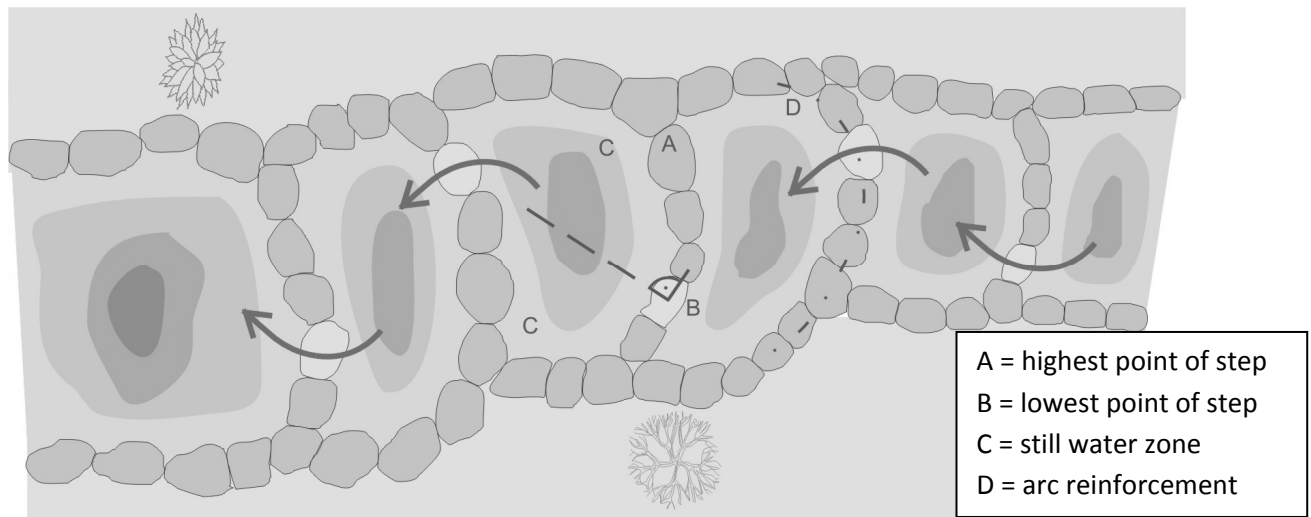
Sketch of a meandering ramp, plan view (Mende, Gassmann 2009, labels translated by author)
